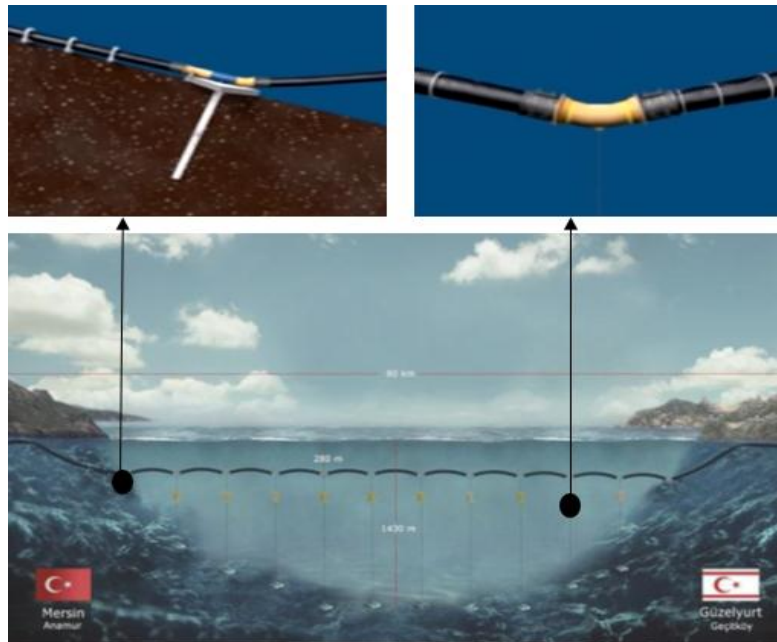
Side View of Sea Crossing Pipeline with Connection Elements.
